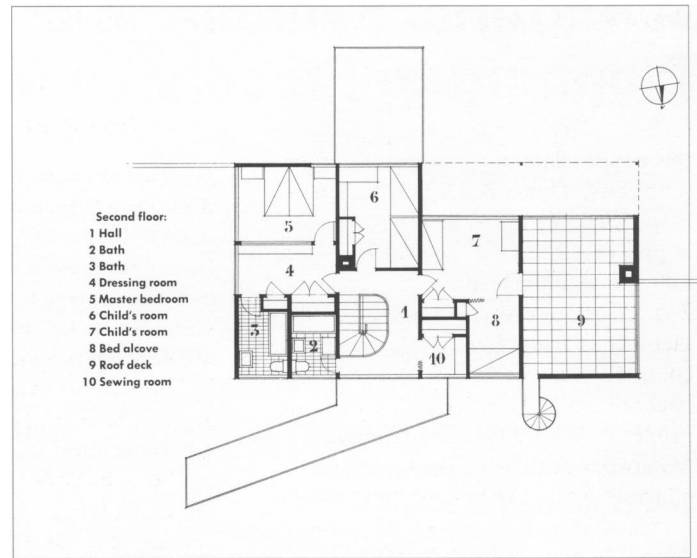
Second-floor plan of the Walter Gropius House in Lincoln, Massachusetts. Courtesy of the Society for the Preservation of New England Antiquities.
